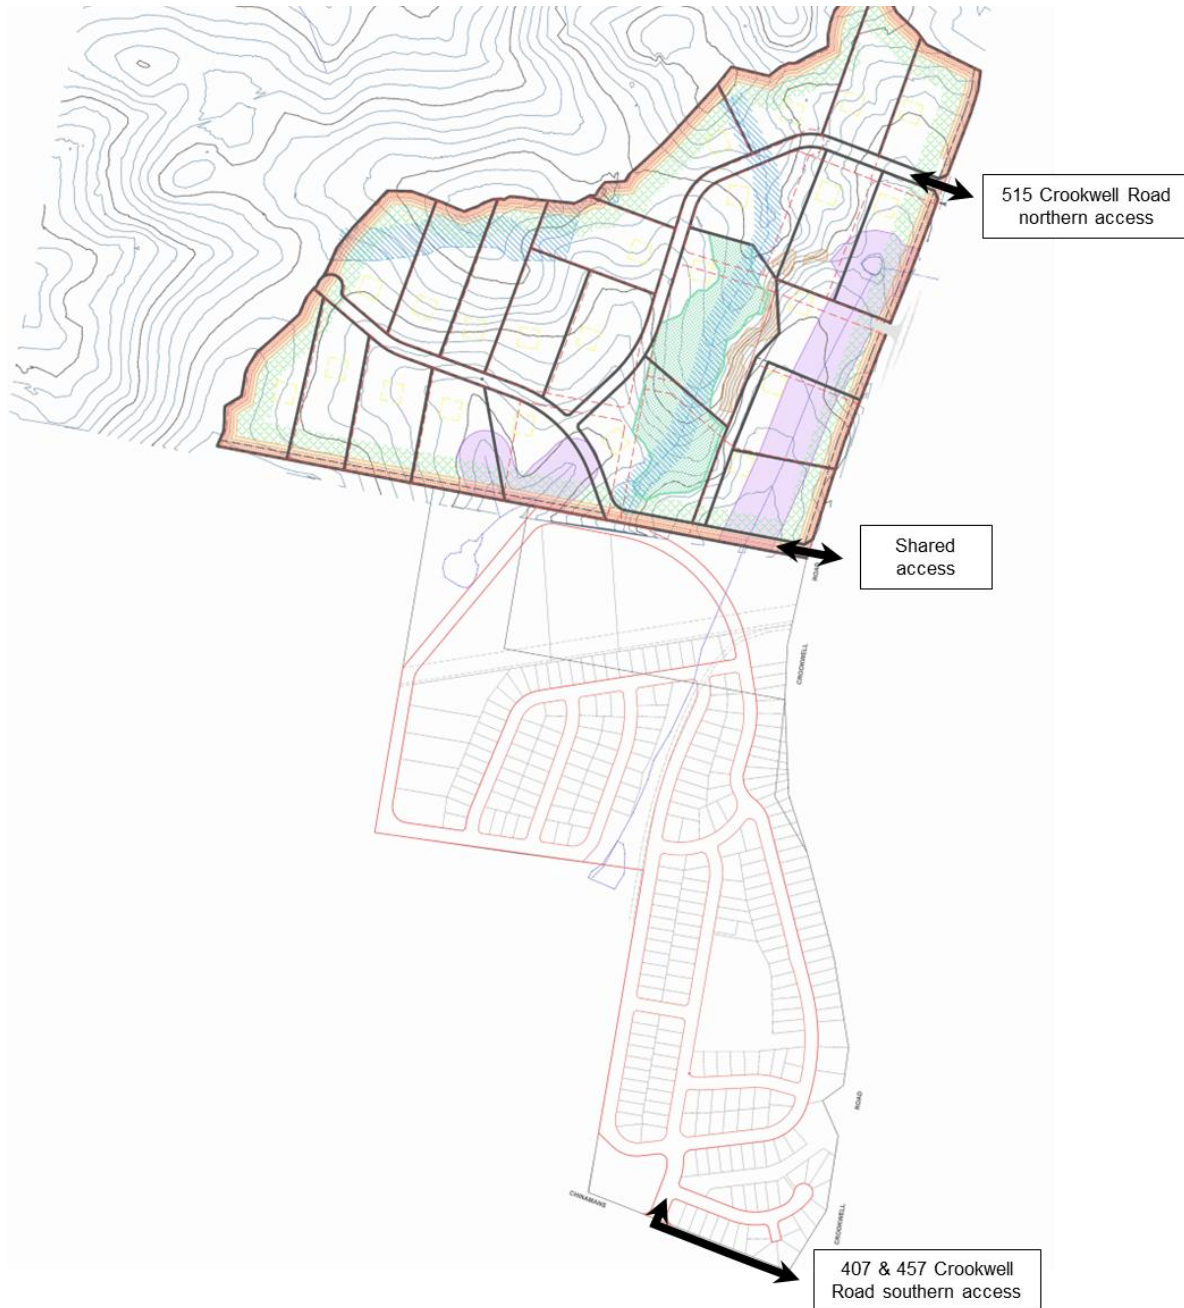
407 & 457 Crookwell Road, Kingsdale residential subdivision
